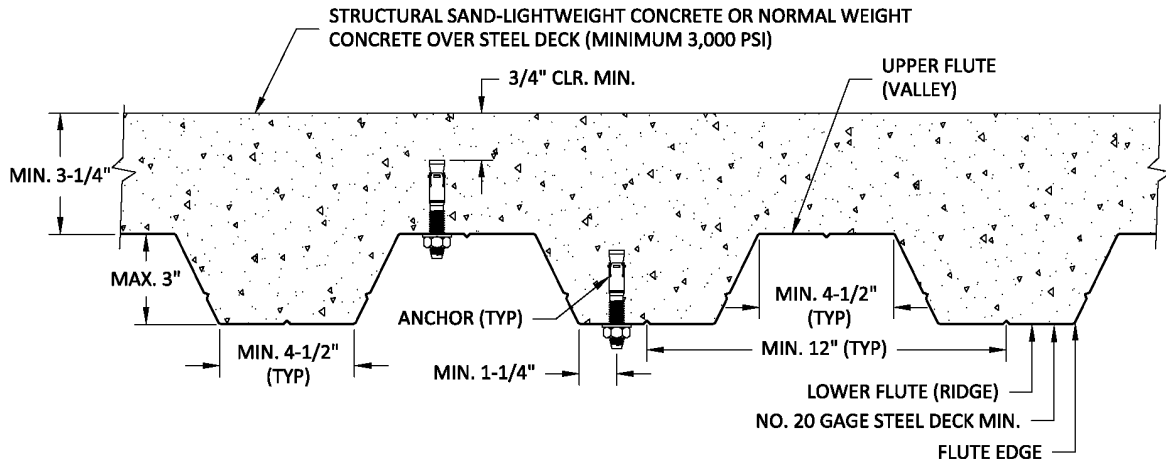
POWER-STUD+ SD1 INSTALLATION DETAIL FOR ANCHORS IN THE SOFFIT OF CONCRETE OVER STEEL DECK FLOOR AND ROOF ASSEMBLIES
